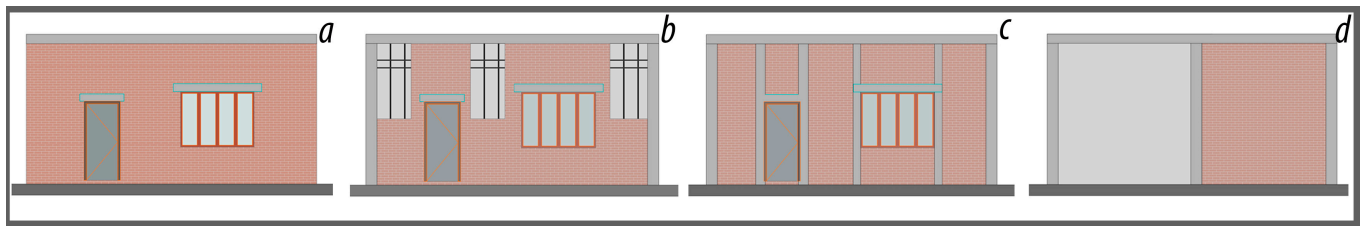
Type of masonry building: (a) Unreinforced masonry, (b) Reinforced masonry, (c) Contained masonry. (d) Mixed system (RC frame and masonry wall).
